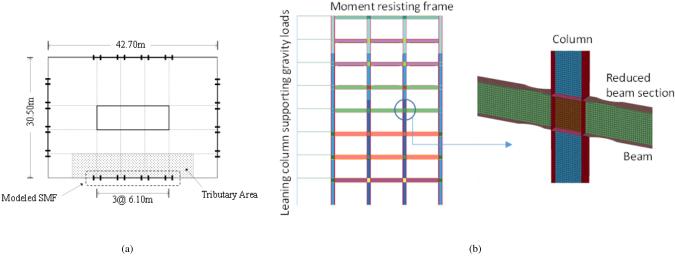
Building plan and finite-element modeling details of perimeter frame. (a) Building plan. (b) SMF model.
